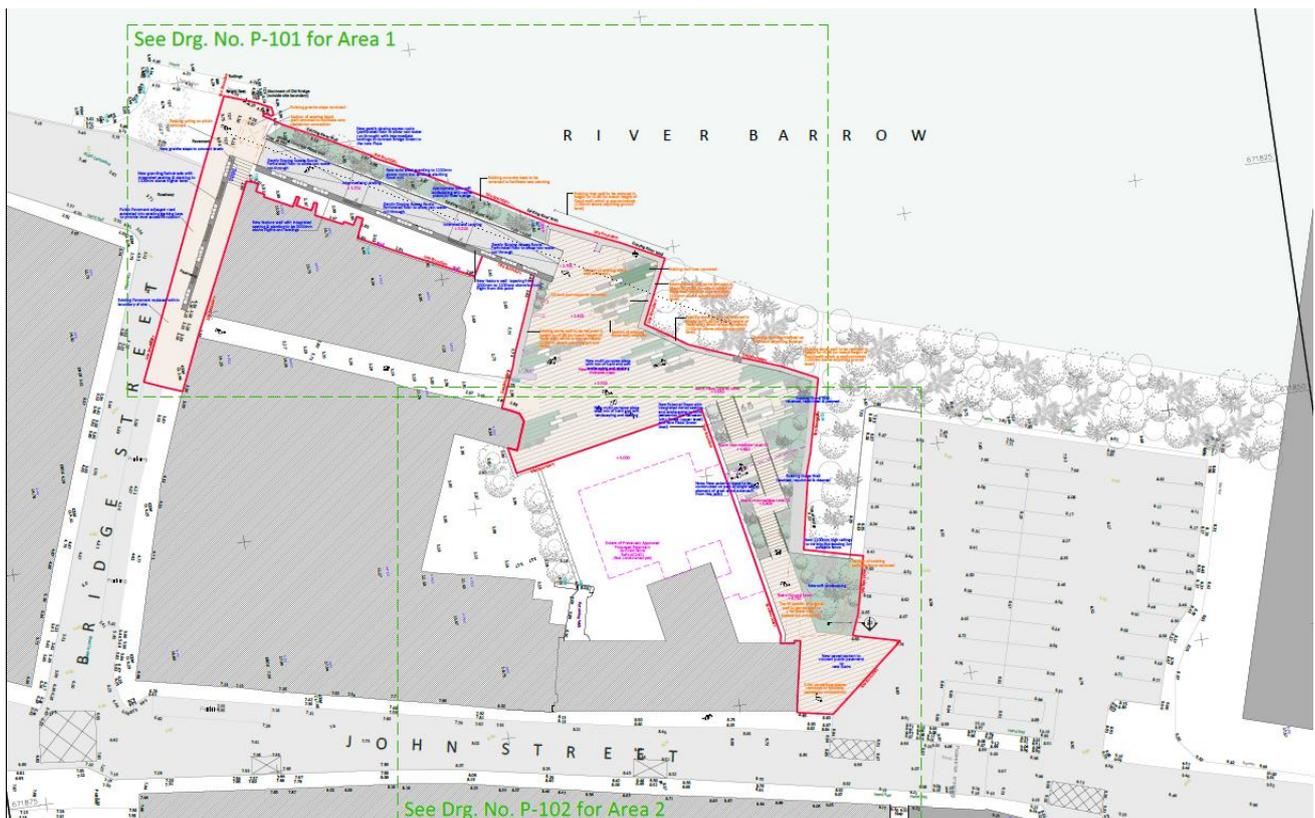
Site Location Plan of subject site (Source: ODKM Architects)
